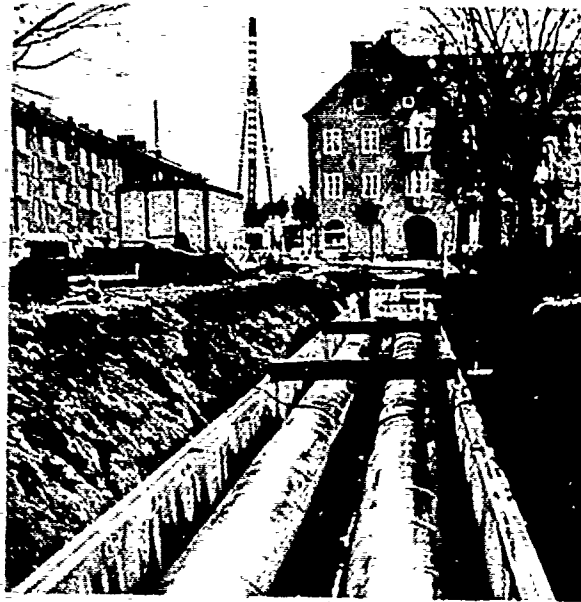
Installation of 800-mm pipes in Malmoe, Sweden.
